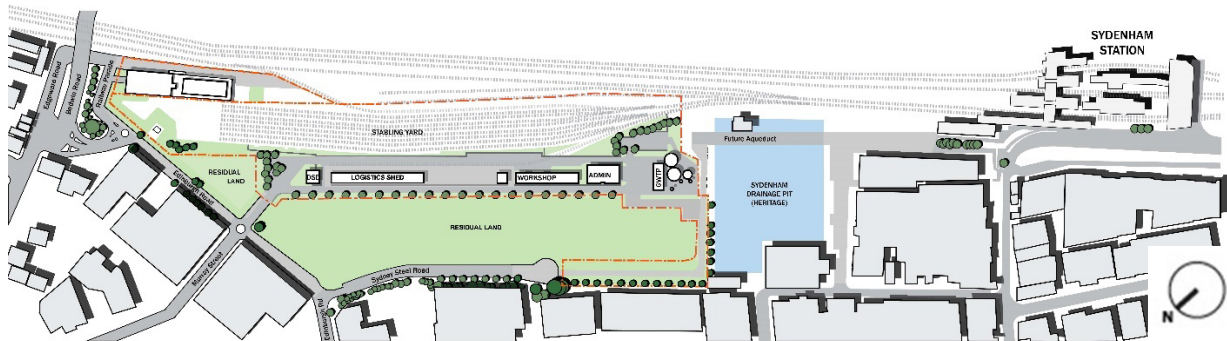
SMTFS – Overall site plan showing site boundary and proposed arrangement of buildings within the site
